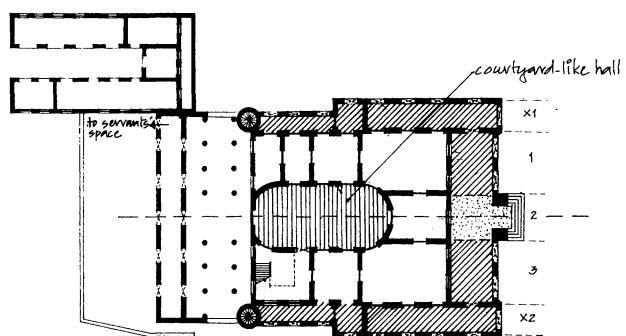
House on 3 Camac Street, ground floor plan showing some nineteenth-century additions
